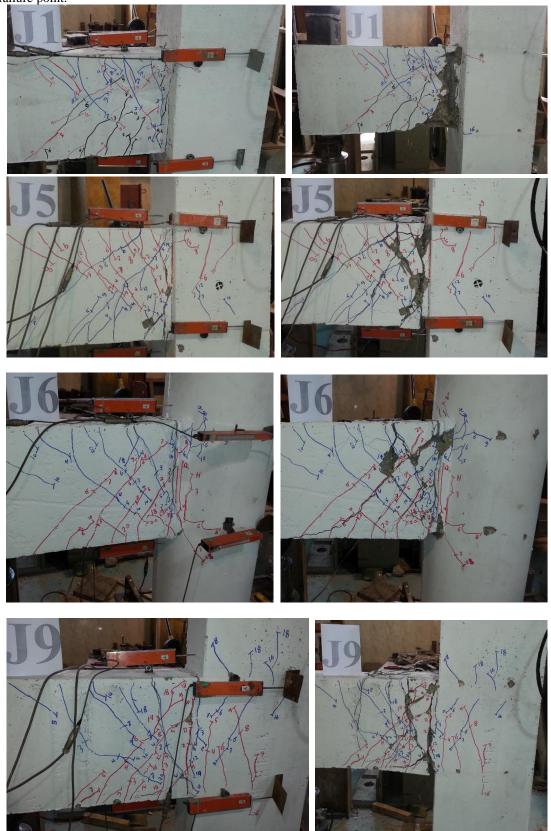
Cracks patterns and failure mode of joint (J1, J5, J6 and J9).
